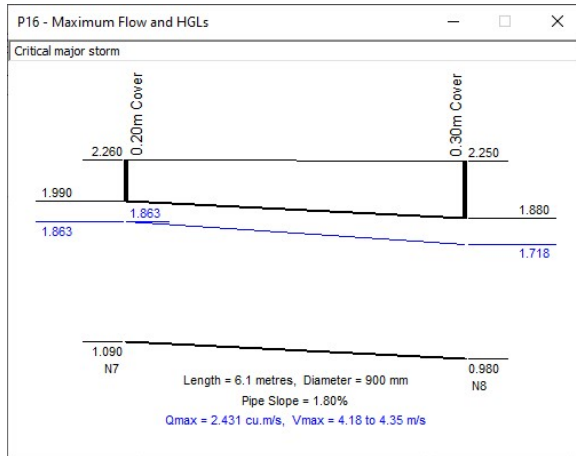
Pipe longitudinal sections and hydraulic grades (1% AEP)
